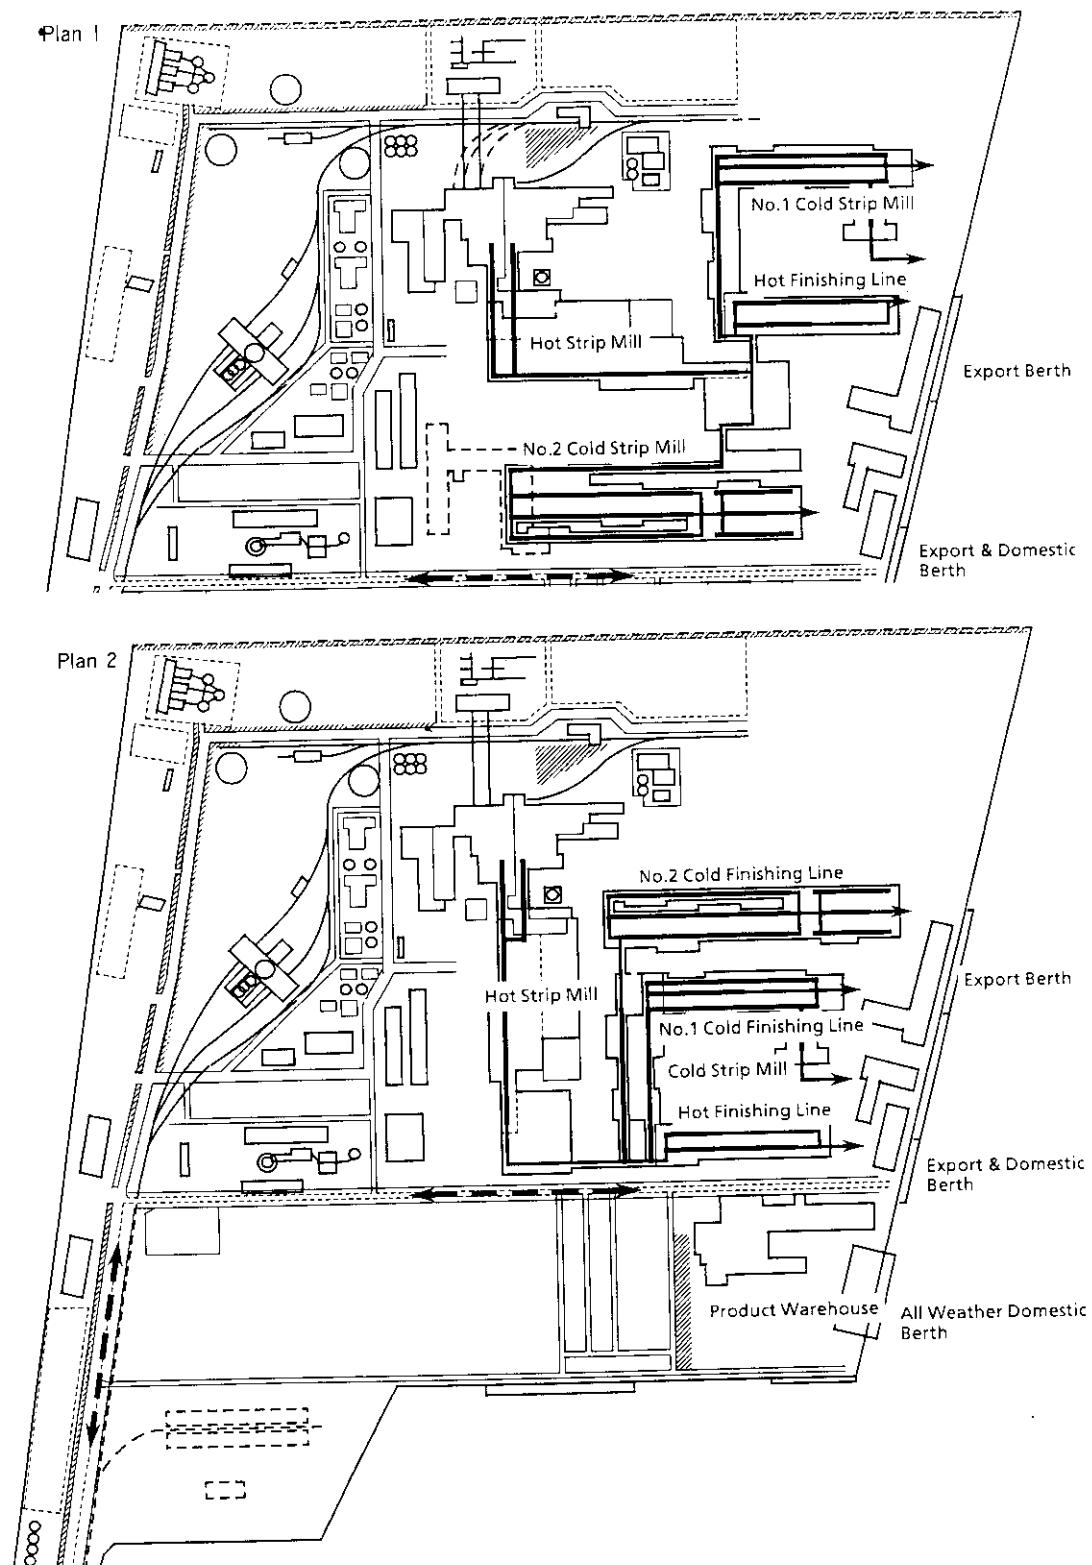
Layout of Hot Strip Mill and Cold Strip Mill
